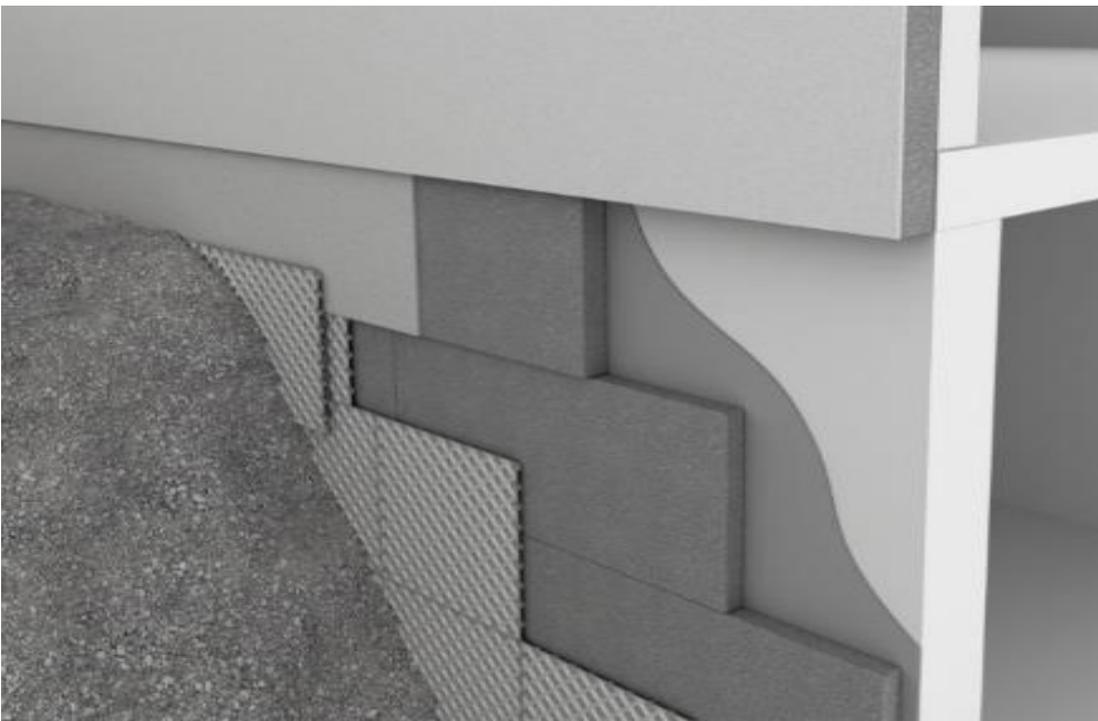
GPS sheets in Foundation Perimeter (insulfoam)
